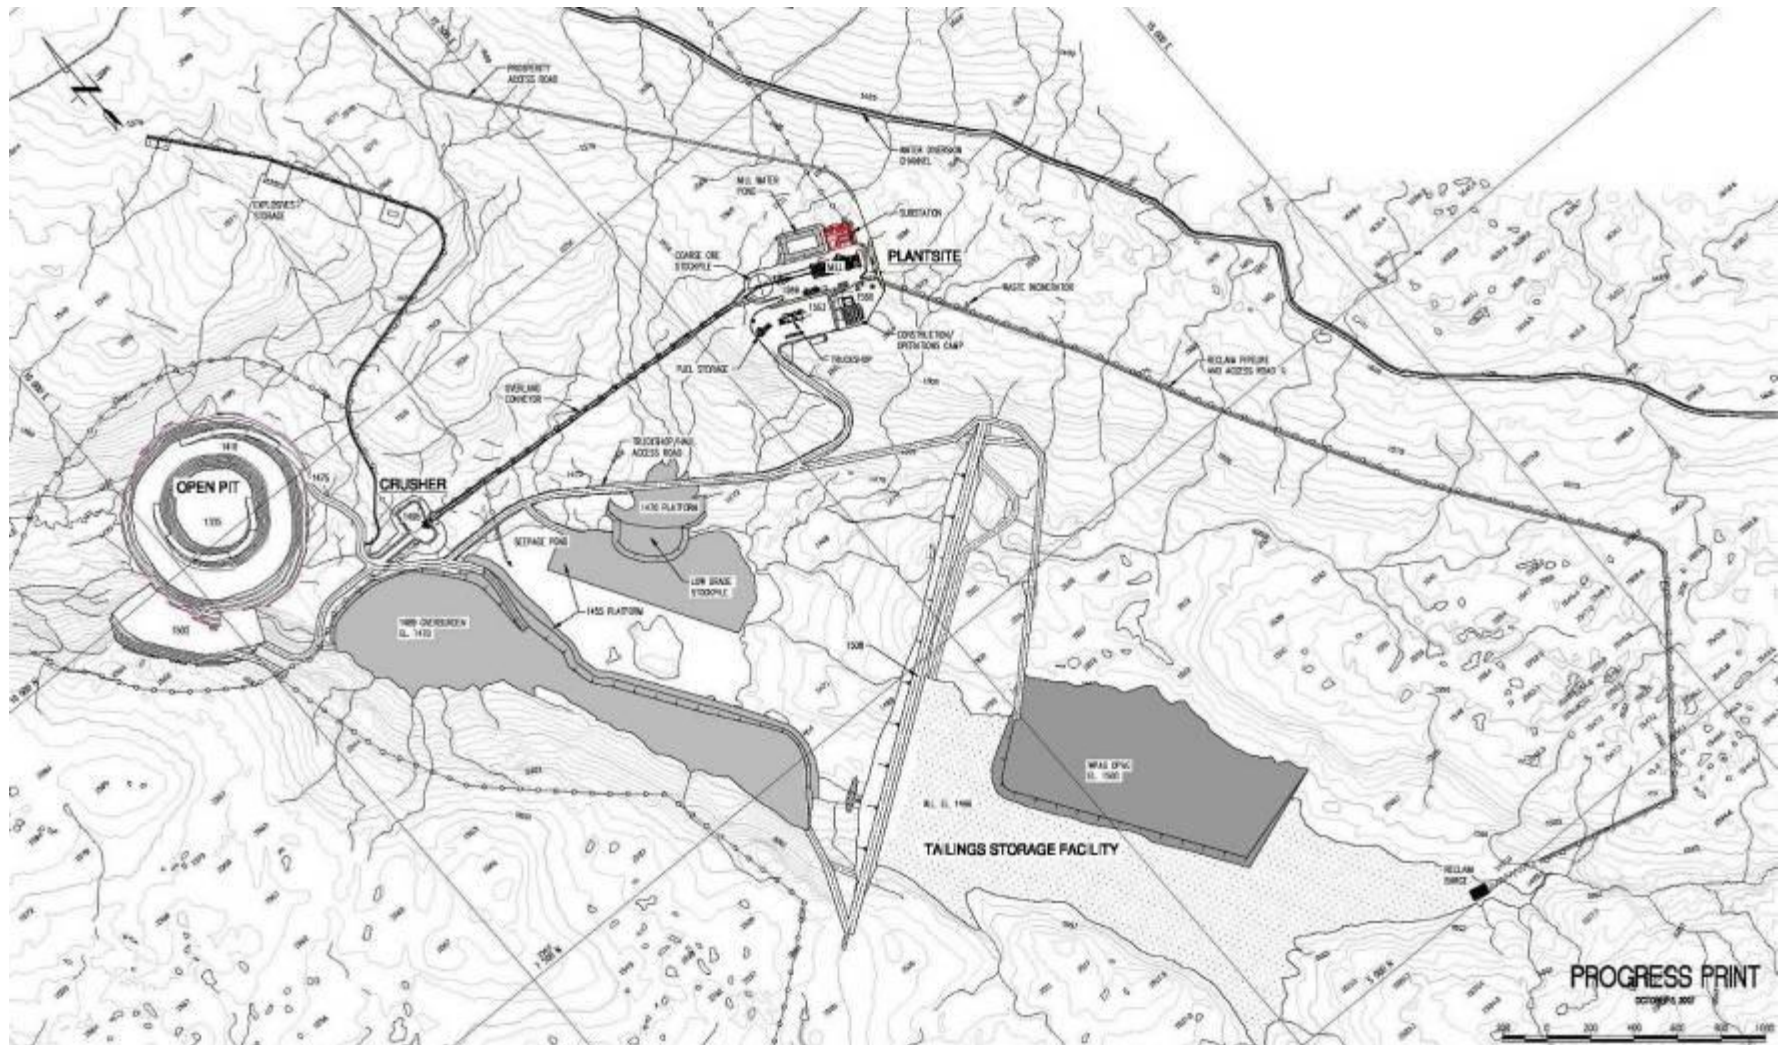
Pit and Stockpiles Plan–End of Year 2
